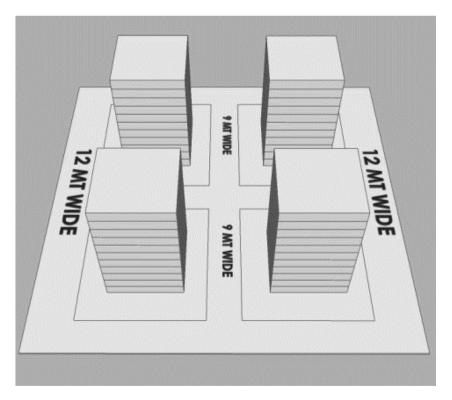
Schematic sketch for urban layouts with building for Private Builders Source: author
